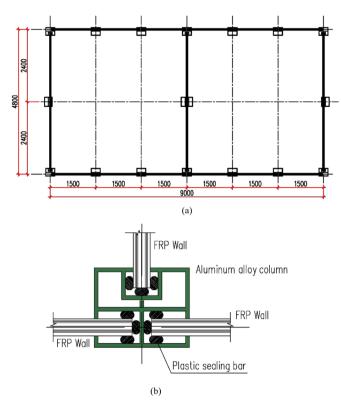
Layout and connection details of the aluminum alloy column. (a) Layout of the sun house, (b) connection details of the side column and the FRP wall.
